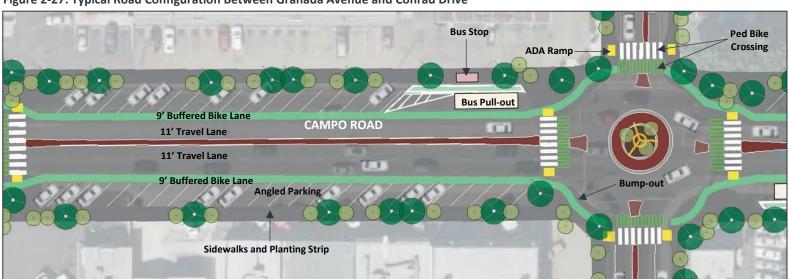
Typical Road Configuration Between Granada Avenue and Conrad Drive
